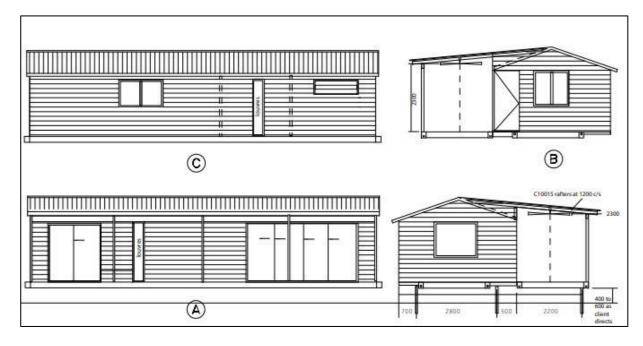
Proposed Secondary Dwelling. (Kwik Built)
